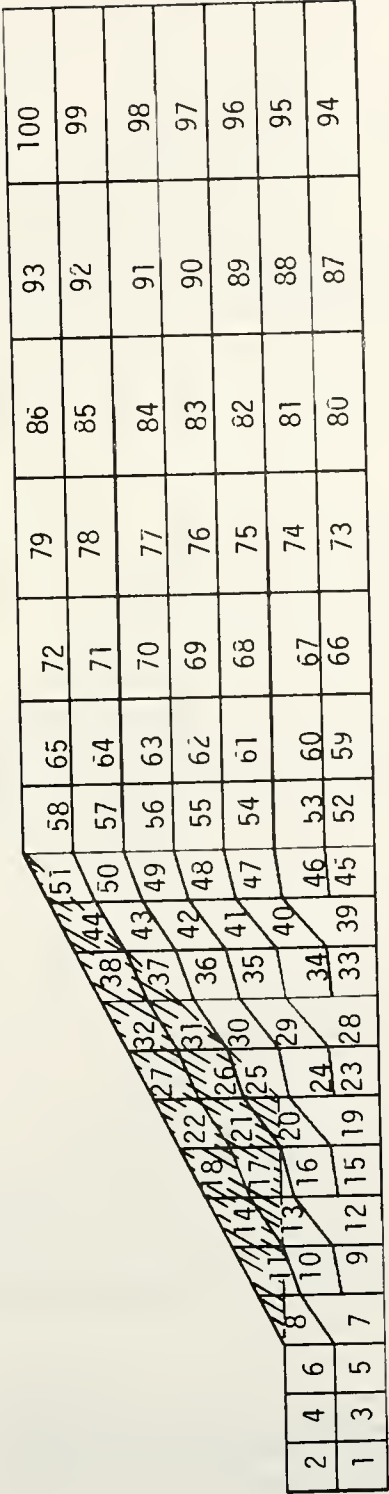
Excavated Mass and Transversed Elements to Determine Forces
